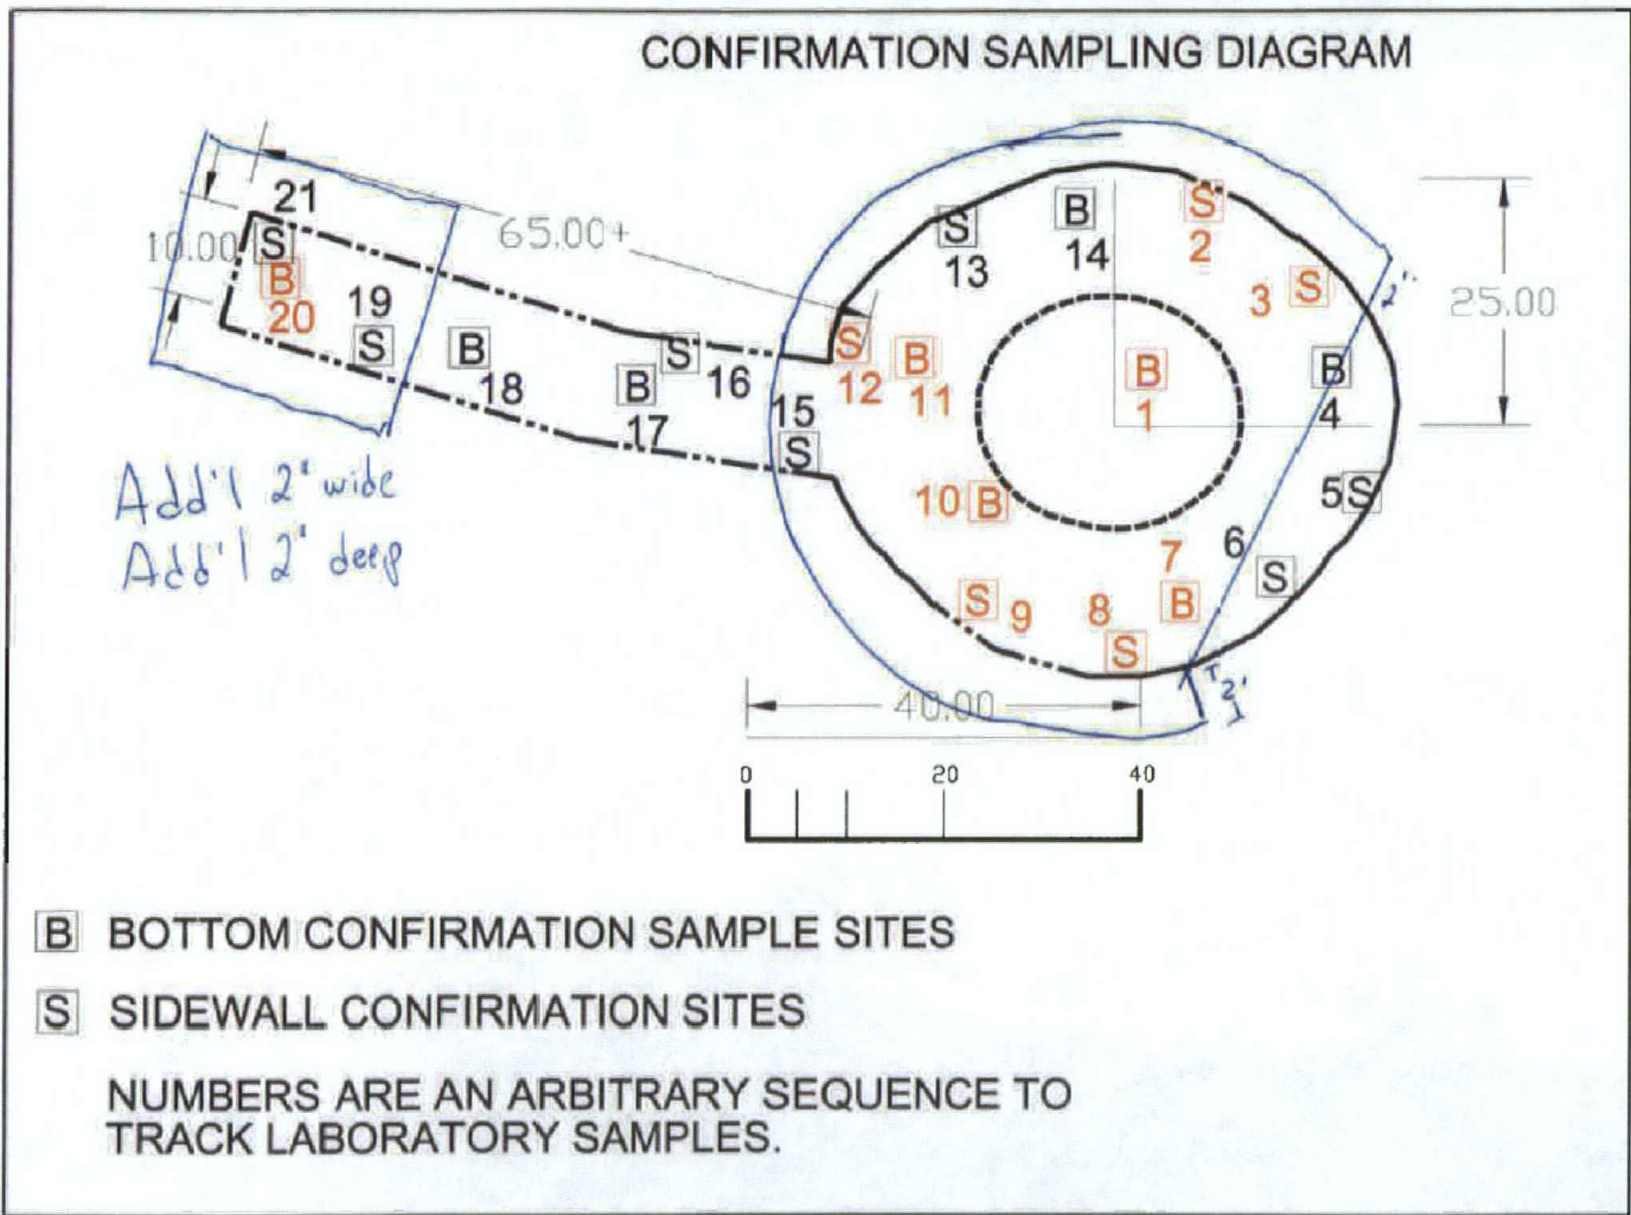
Site Sketch Illustrating Excavation Requirements Provided by the Navy
